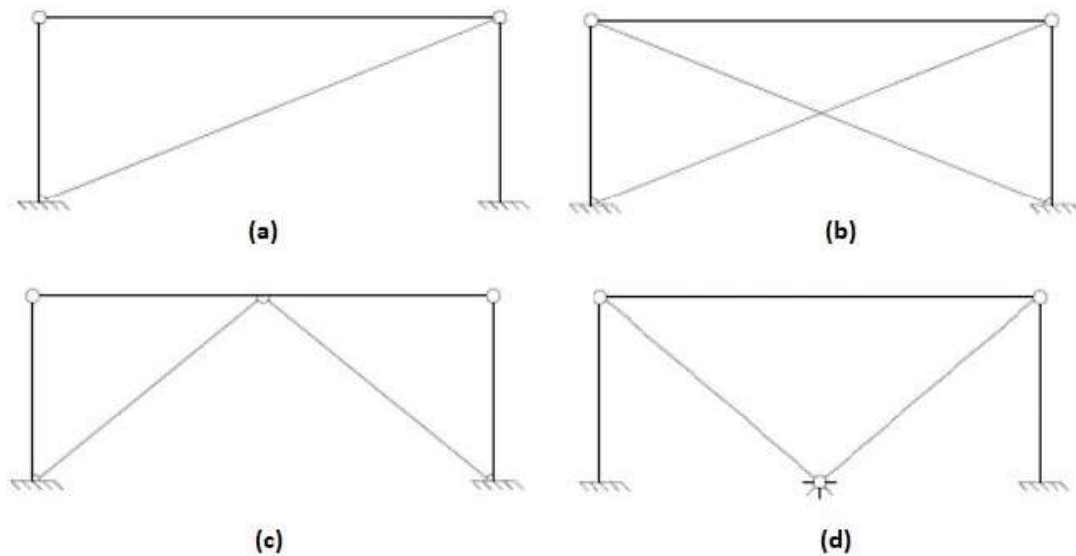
Typical bracing configurations: (a) single diagonal, (b) cross, (c) chevron, (d) V-shaped
